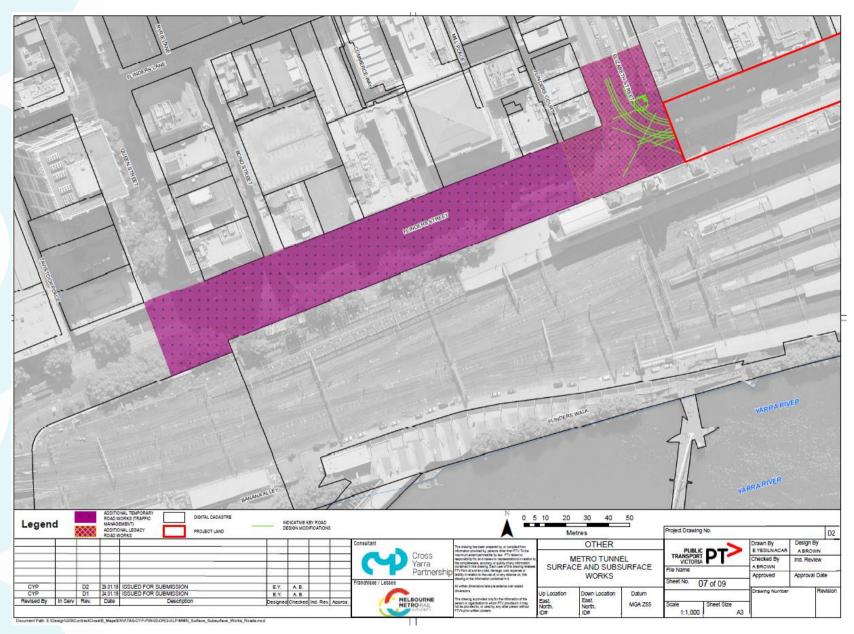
FLINDERS STREET ADDITIONAL ROAD SURFACE WORKS
